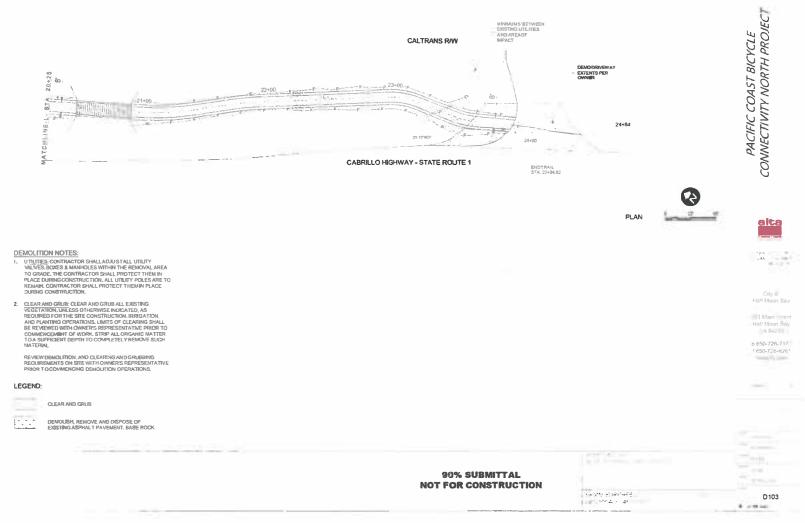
Proposed Project, 90% Plans, Sheet 3 of 3
